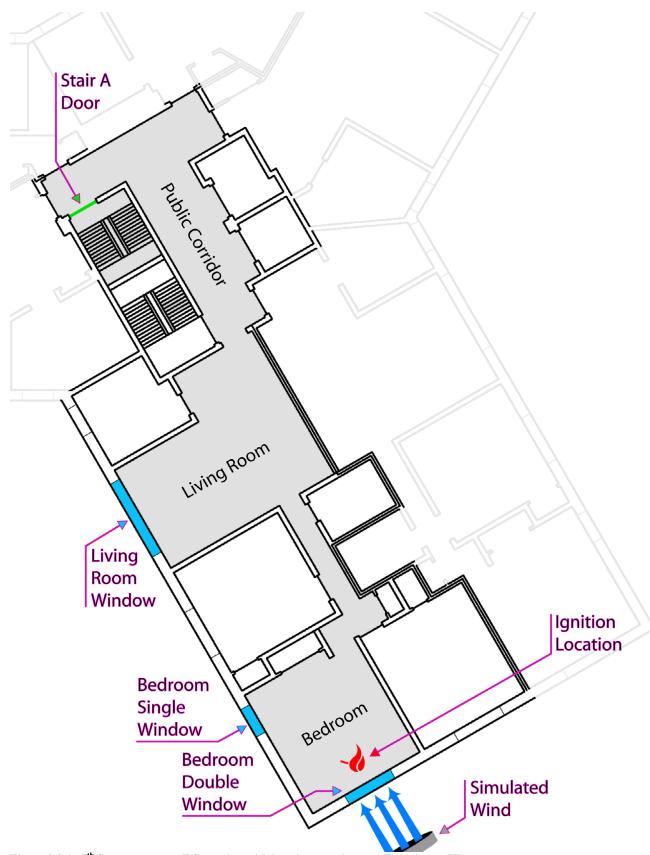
7<sup>th</sup> floor apartment E floor plan with locations pertinent to Experiment 7E
